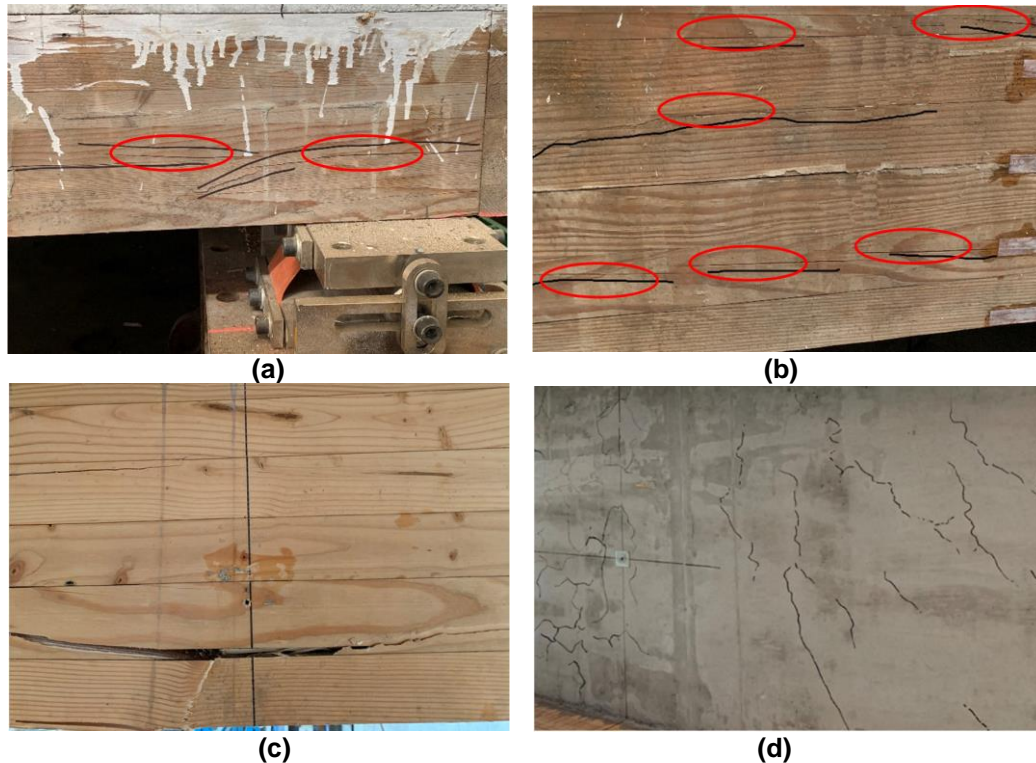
Test phenomenon and failure mode: (a) Wood cracks at the support; (b) Wood cracks along the span direction; (c) Tensile failure of the wood member; (d) Cracks at the bottom of concrete slab
